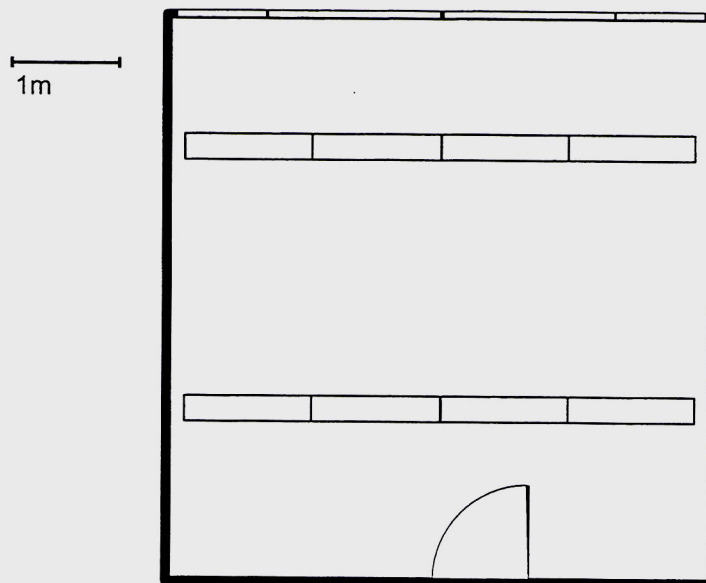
Schematic drawing of original office room and lighting equipment.
